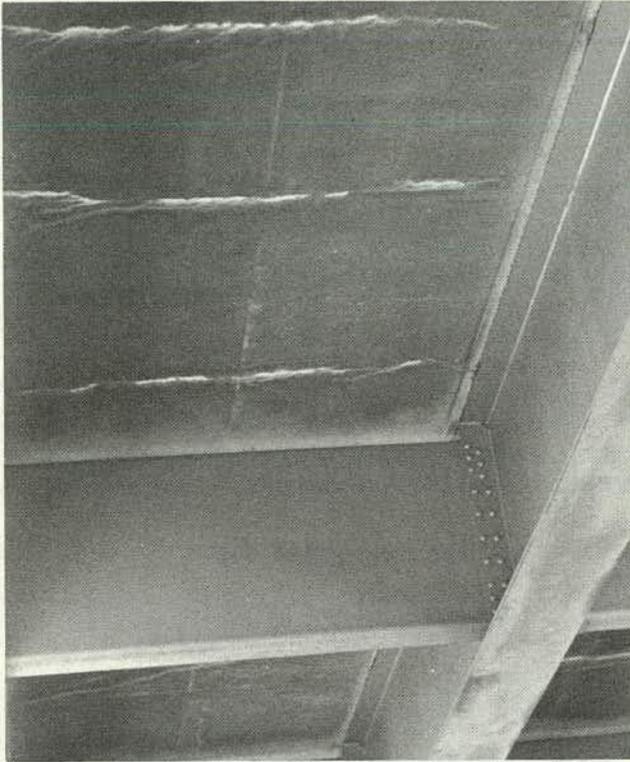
Underside of deck slab of Structure 27906. The concrete overlay on the deck surface is free from cracks.
